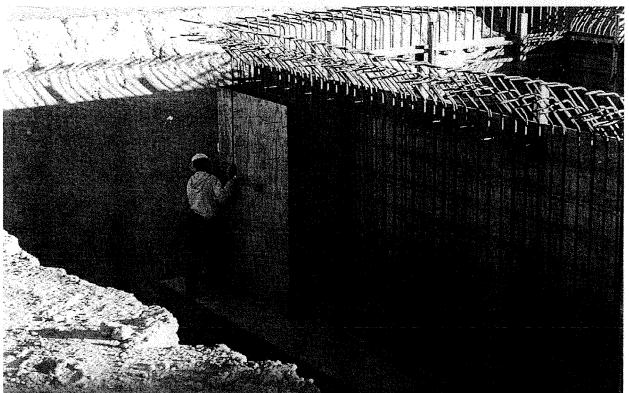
Typical view of the vertical and horizontal reinforcement in the walls of the tanks.
